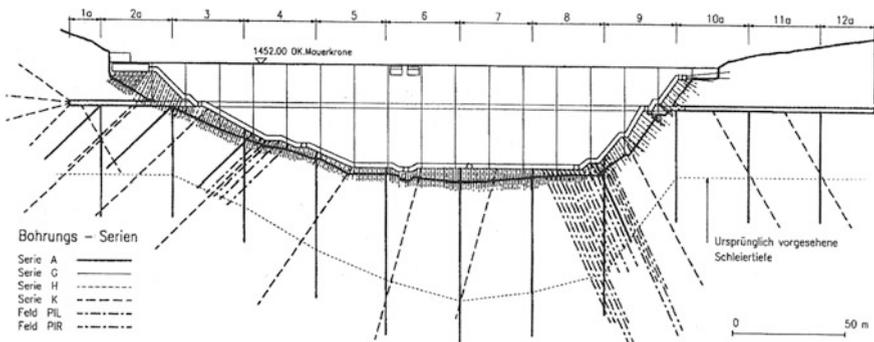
Panix Dam. Original area of grout and boreholes curtain eventually carried out: Series A and K—drilled for investigation, Series G and H—contact grouting along the inspection gallery, PIL and PIR—local test grouting on the left and right slopes, respectively
